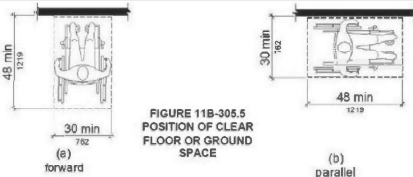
B-305.5 POSITION OF CLEAR FLOOR OR GROUND SPACE
